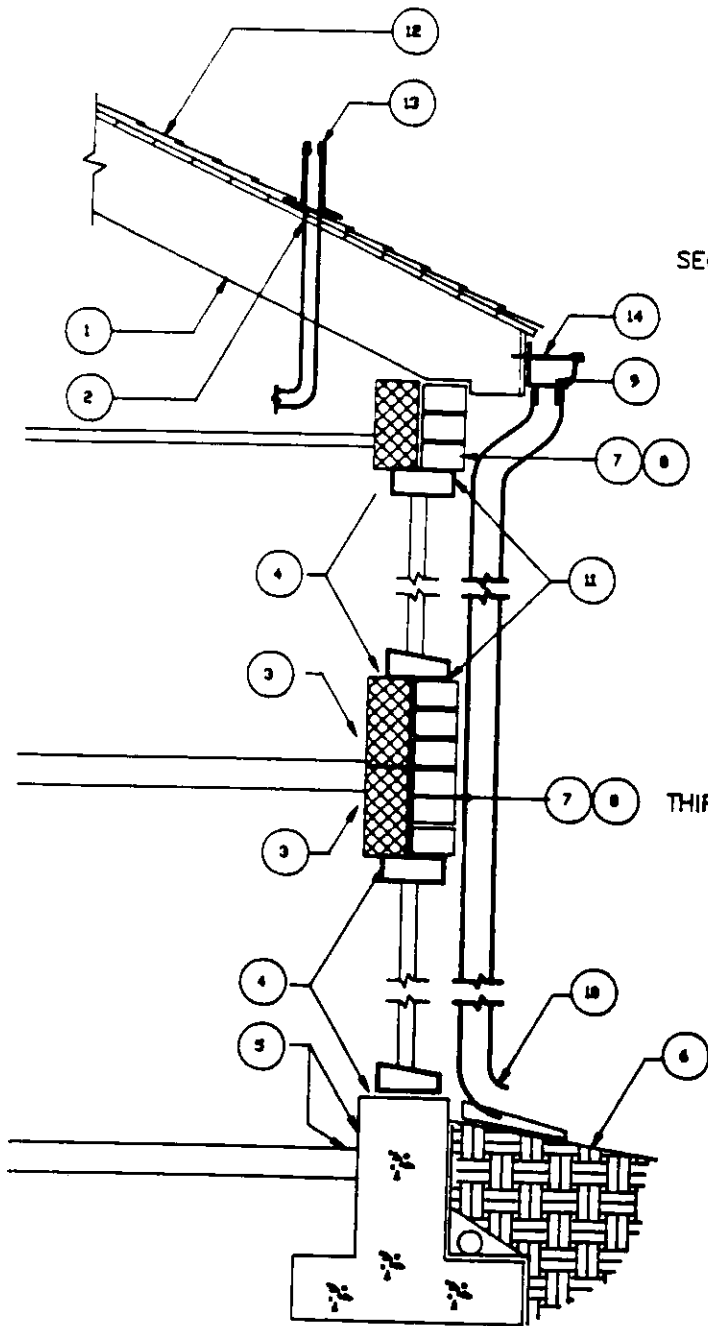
Components of a Visual Inspection—Sloped Roofs
